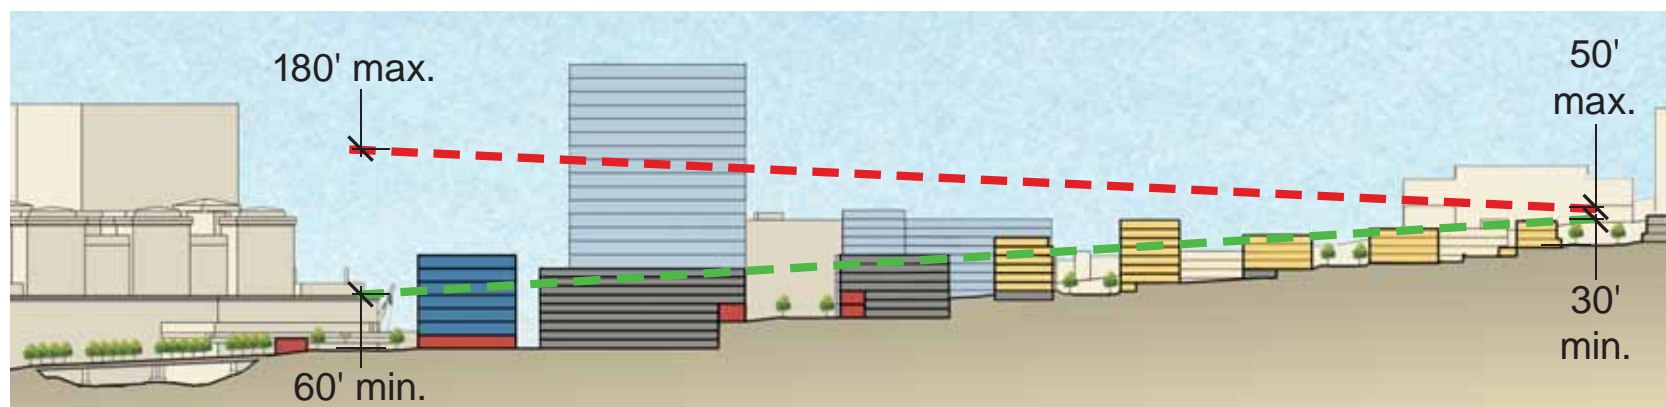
Conceptual Site Section: Red line indicates maximum building height within the site and green line indicates minimum building height. Each line is taken from center of Crawford Street to center of Washington Place. n to the left
